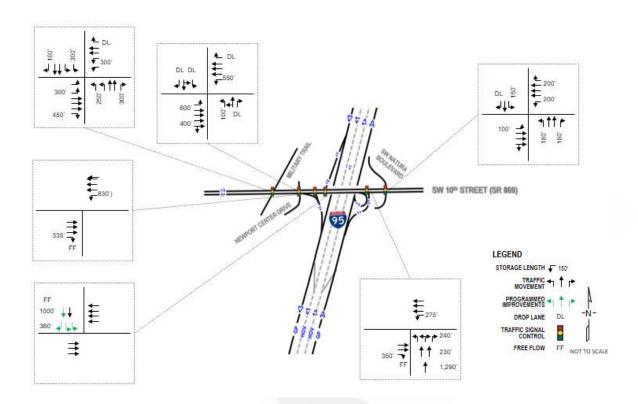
Existing Roadway and Intersection Lane Configurations
